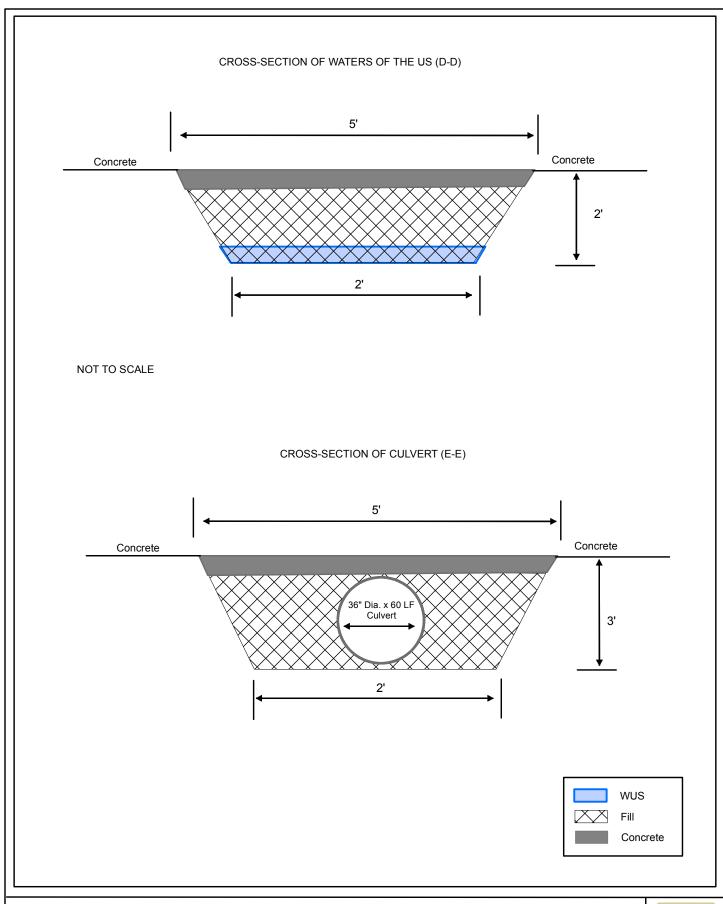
Typical Cross-Sections of Waters of the U.S.(D-D) and Proposed Culvert (E-E)
